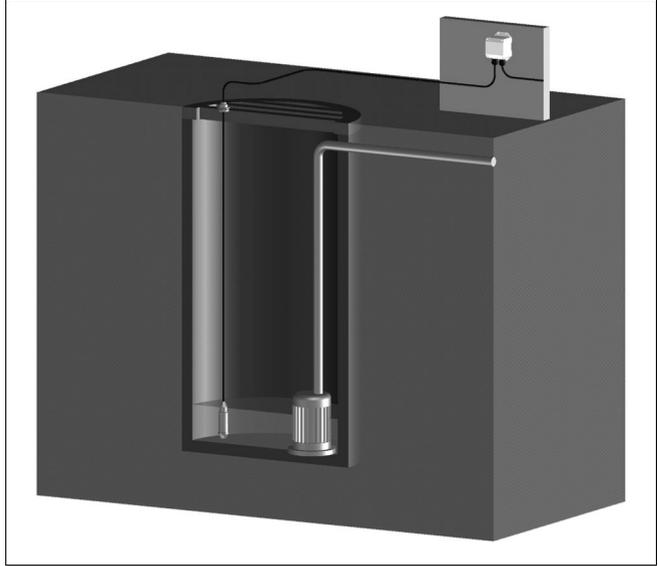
Mounting example: VEGAWELL 52 in a pump shaft with breather housing VEGABOX 02
